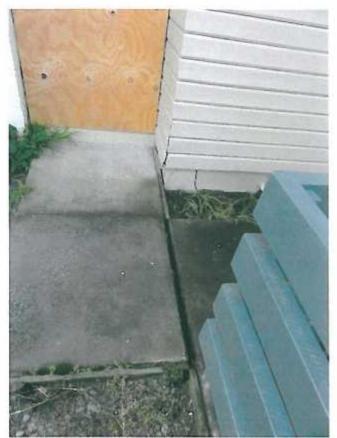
Crack in foundation in western side of Unit 8.
